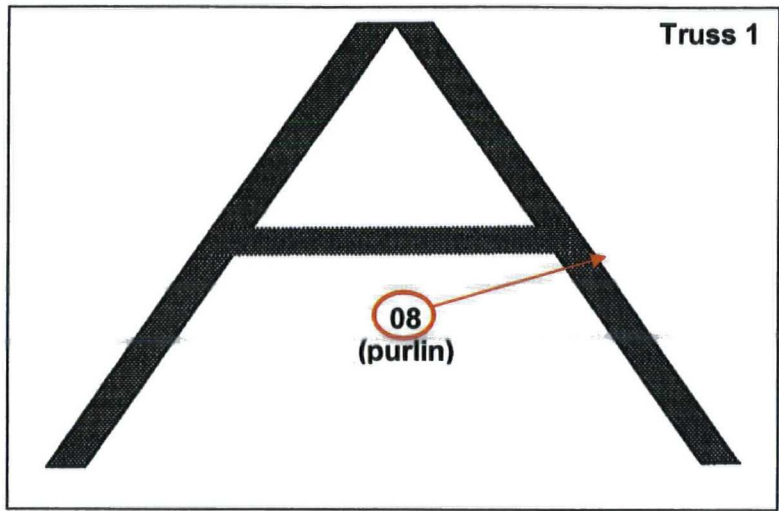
i: Main or stables range roof trusses to show sample locations (viewed from east looking west)
